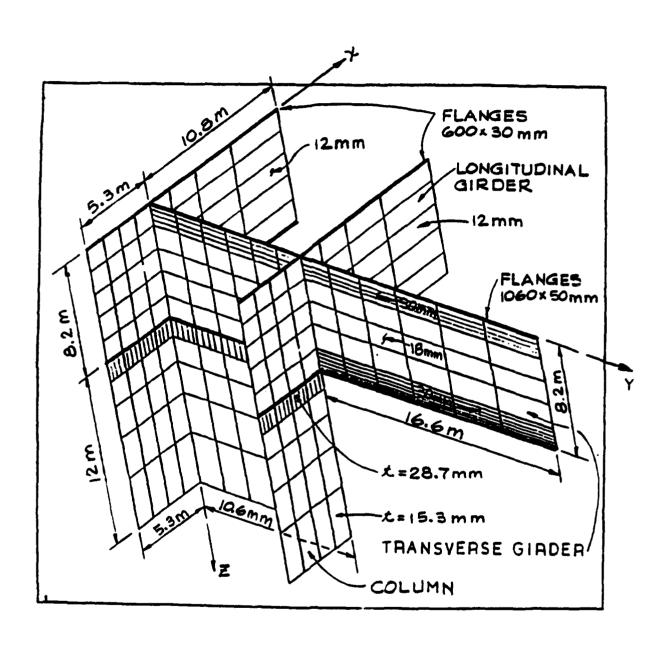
Finite Element Model and Dimensions of Column-to-Girder Connection
